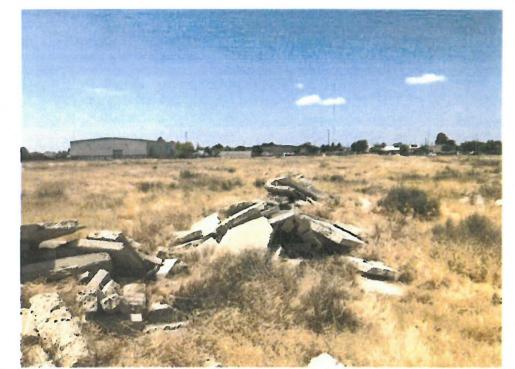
Typical view of concrete rubble refuse that has been dumped on the site to the south of the offsite stormwater basin.
